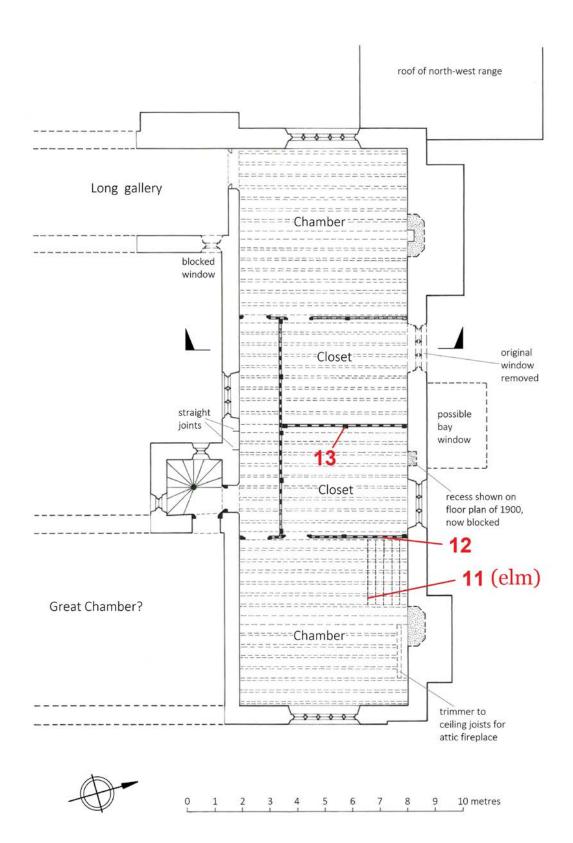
Plan of the first floor of the north range of Creeksea Place, showing the timbers sampled for dendrochronology (adapted from an original drawing by Tim Howson)
